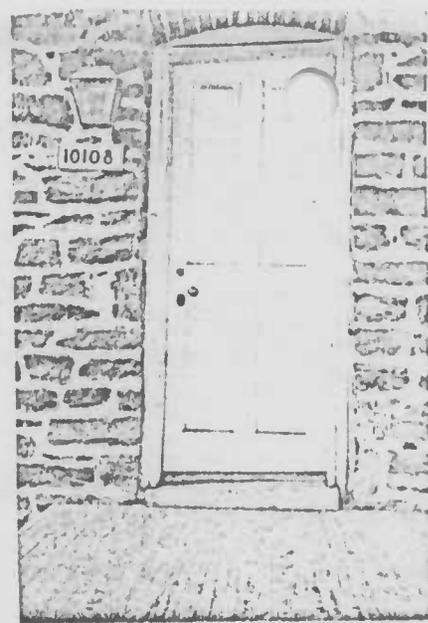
"TYPICAL" VILLAGE DOOR FROM 10108 TOWNHOUSE.
